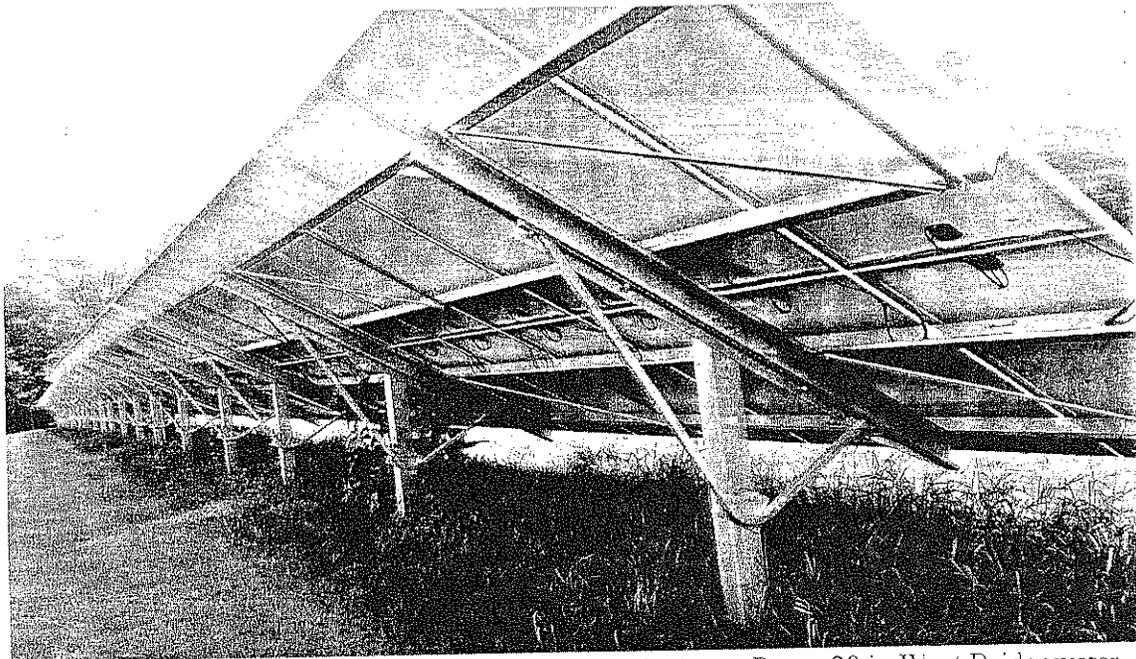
Rear view of photovoltaic panels at Asack site on Route 28 in West Bridgewater
